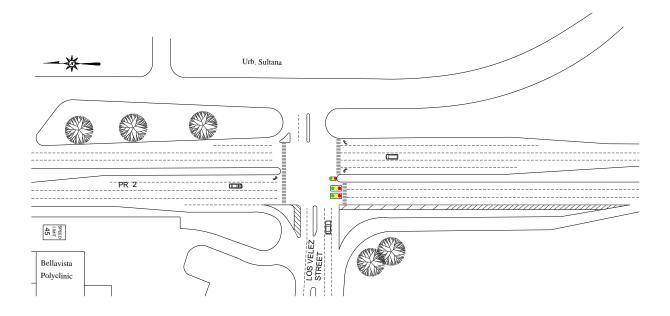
Plan view of the Intersection of PR-2 with Los Velez Street
